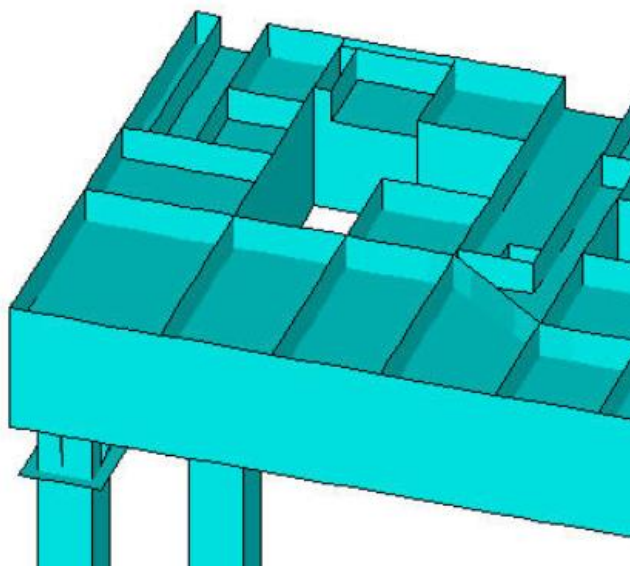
Typical Arrangement of Stiffeners in Steel Foundation Deck
